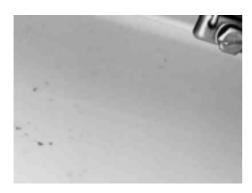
Dew condensation eliminated after installation of DryKeeper.
